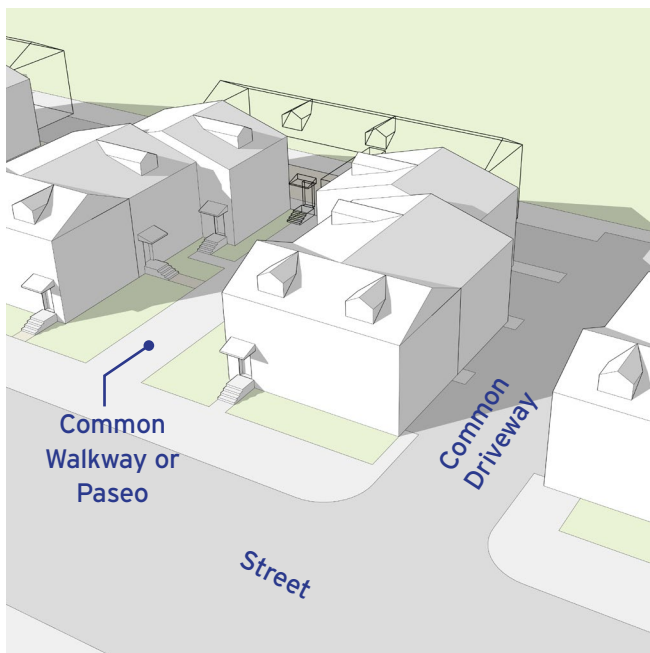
Auto Court or Six/Eight Pack Diagram
